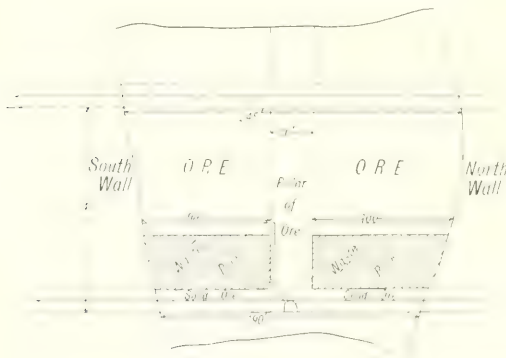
LONGITUDINAL SECTION WITH CENTRAL PILLAR.
